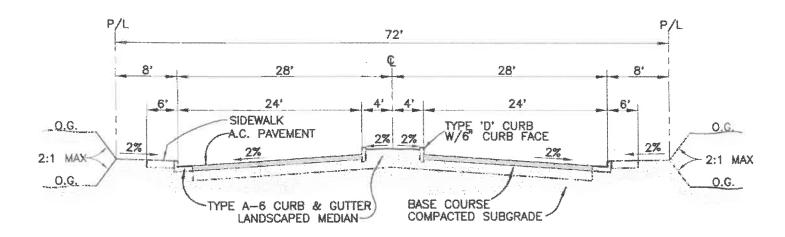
A NO. SPECIFIC PLAN No.330
